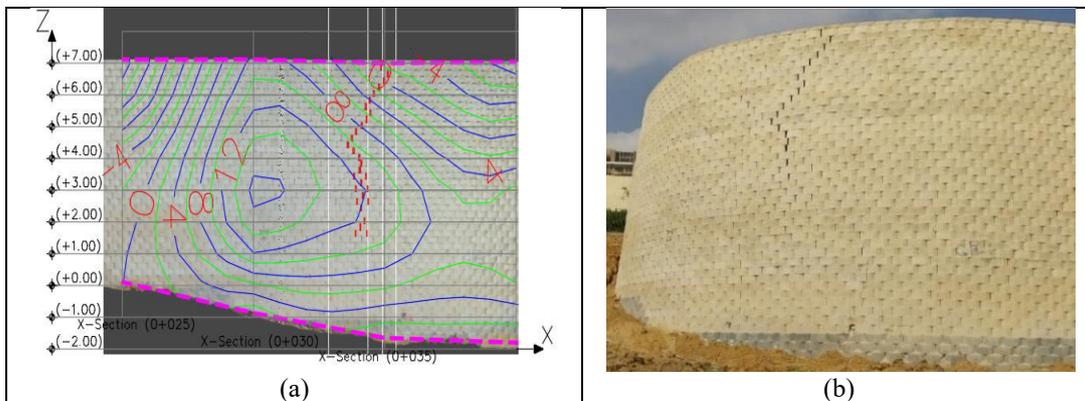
The Cracks (a) is the orthophoto for the wall showing the cracks and contour (b) Is the original photo on the wall.
